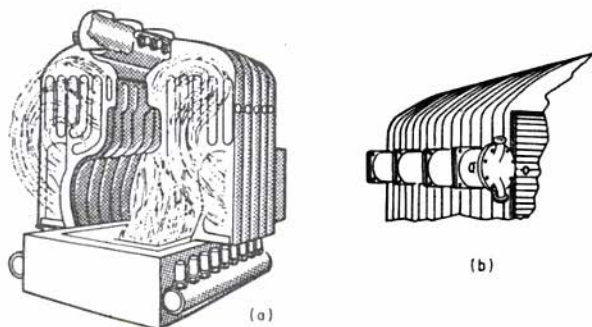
(a) Gas travel in header-type cast-iron boiler. (b) Manifold for heating domestic hot water.
